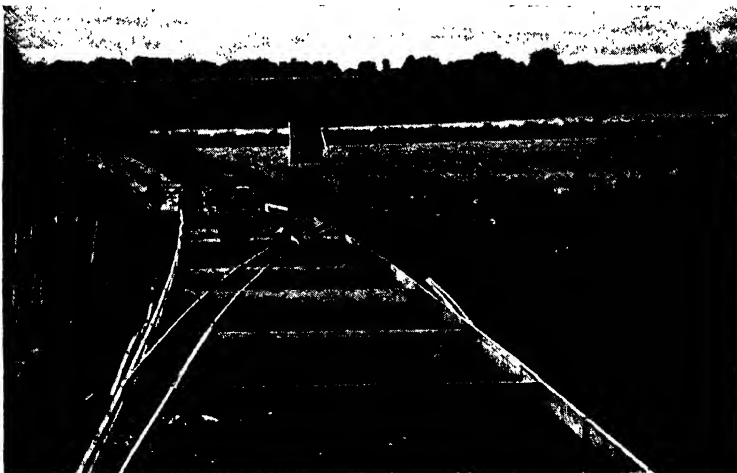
TIMBER FORMS FOR ALTERNATE-BAY CONSTRUCTION.
